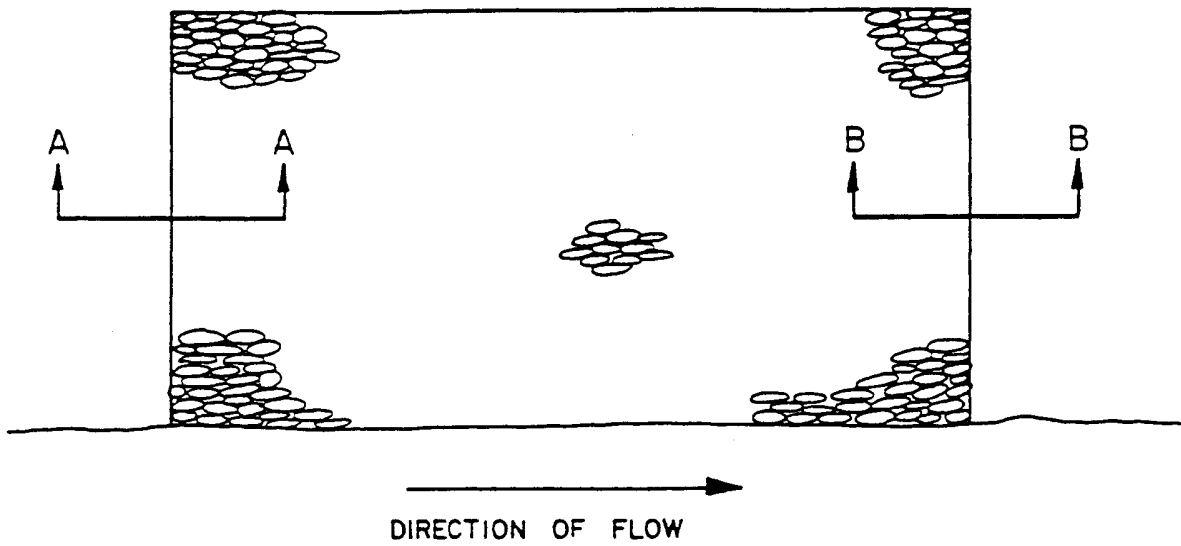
Typical Riprap Installation - Plan and Flank Details
